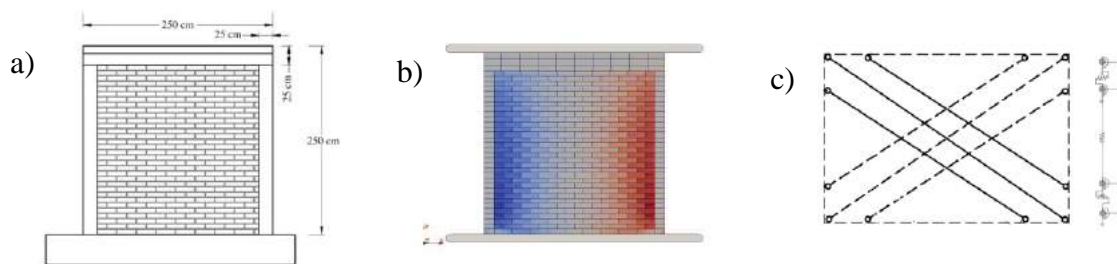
Overview a) of Wall M2 [14], b) discrete element model, and c) multi strut model.
